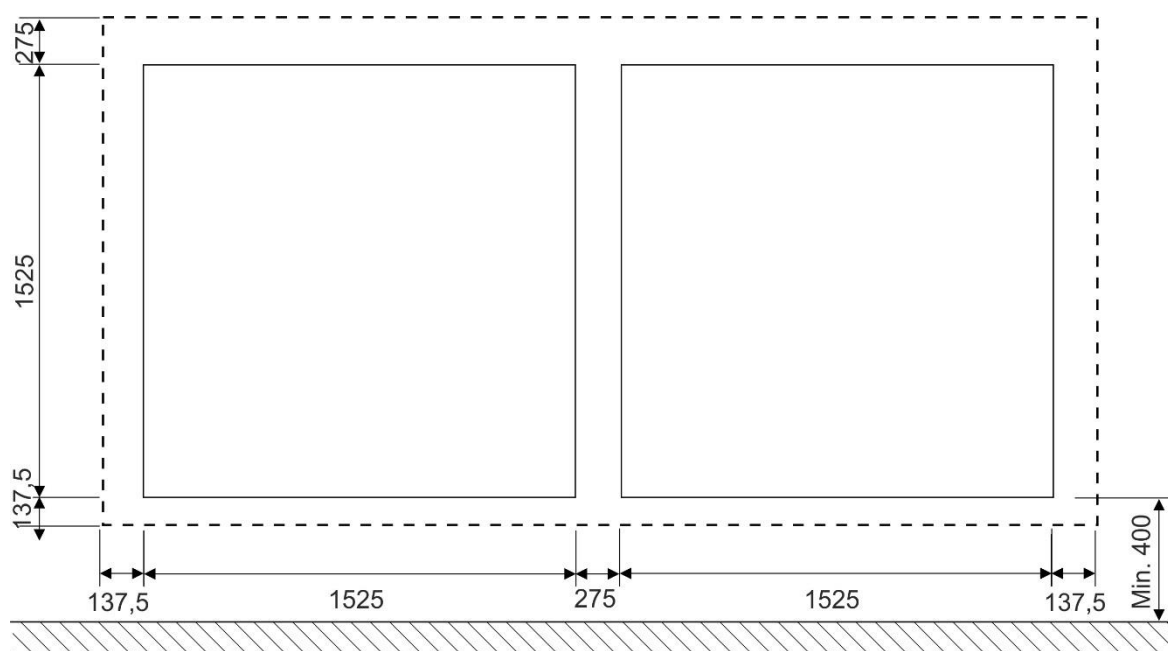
Minimum distance from DA 1700 to wall, floor and ceiling
